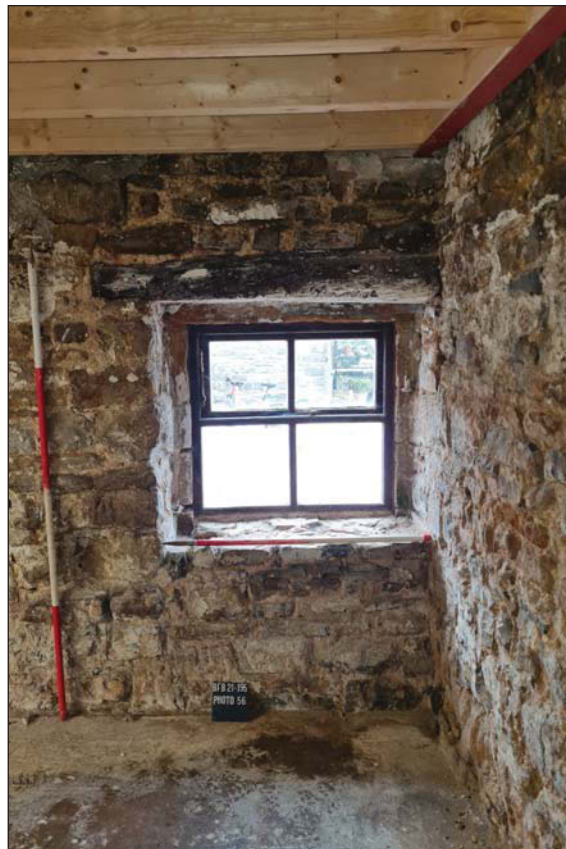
View to former door and replacement window, looking east, scales 2m and 1m
